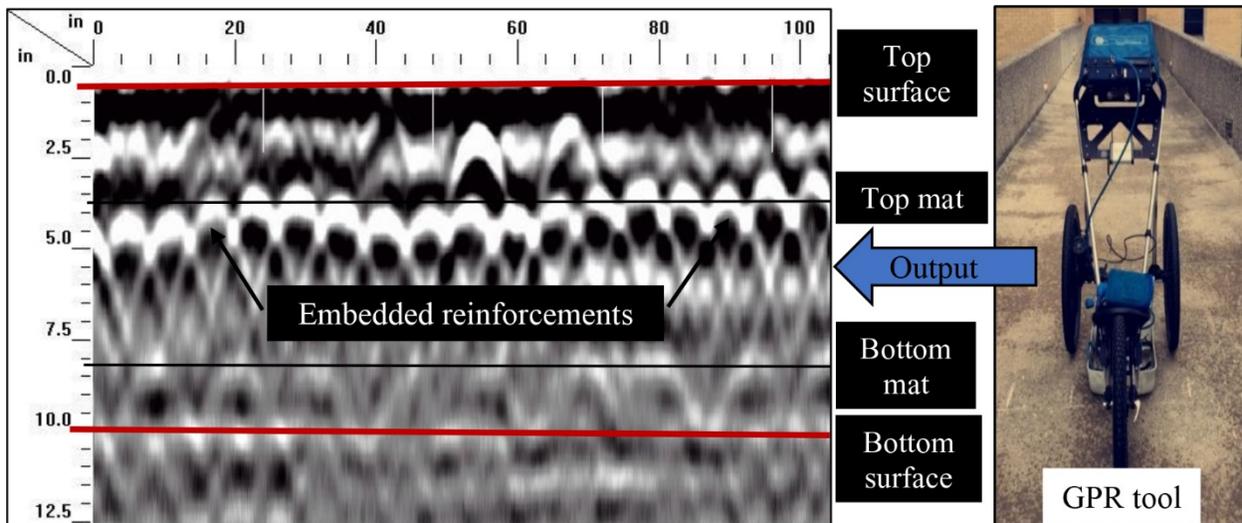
An example of processed GPR output showing embedded concrete reinforcements
